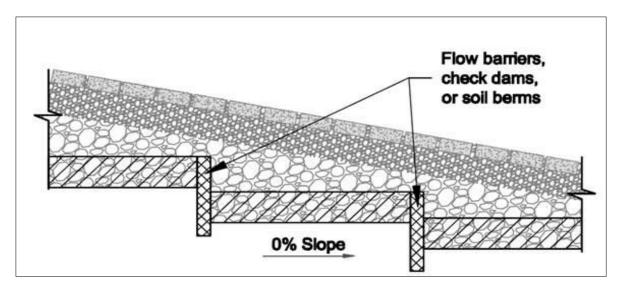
Use of flow barriers to encourage infiltration on sloped sites.
